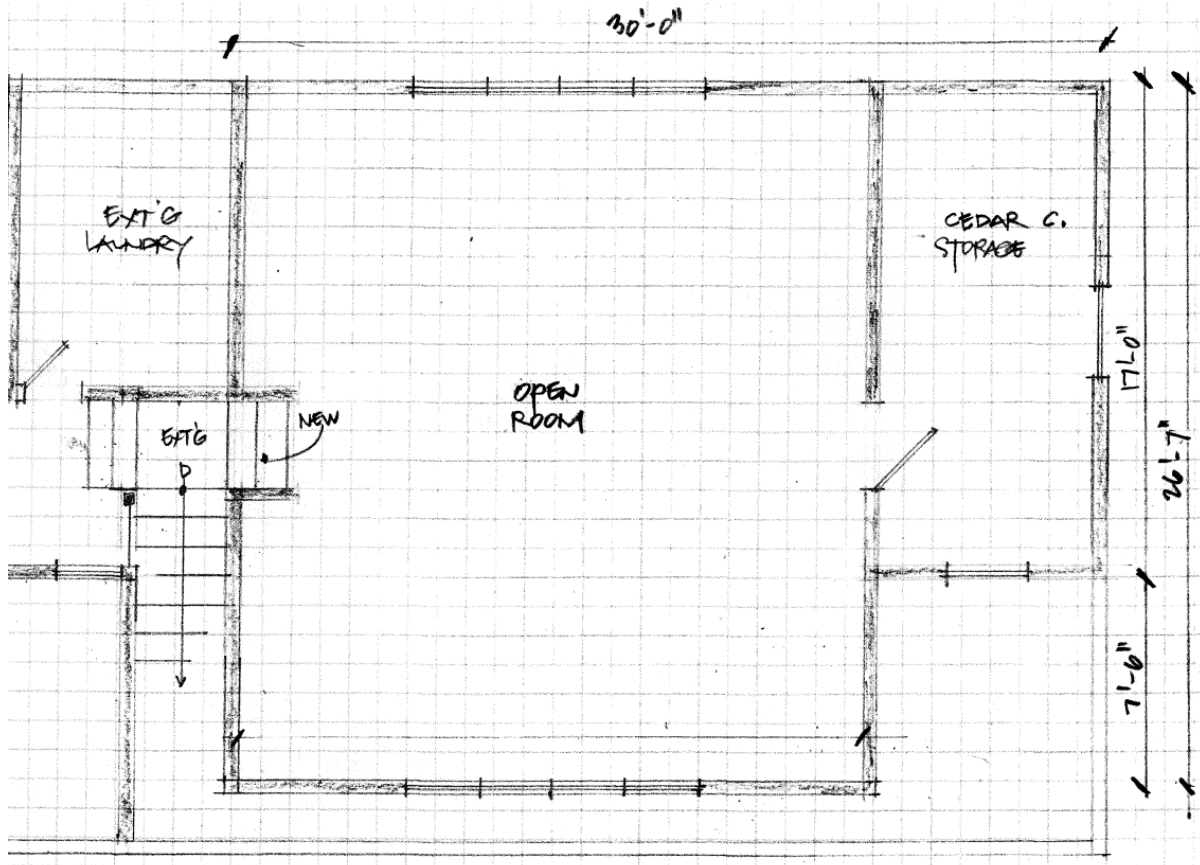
Previous floor plan of proposed second-floor addition (October Meeting)
